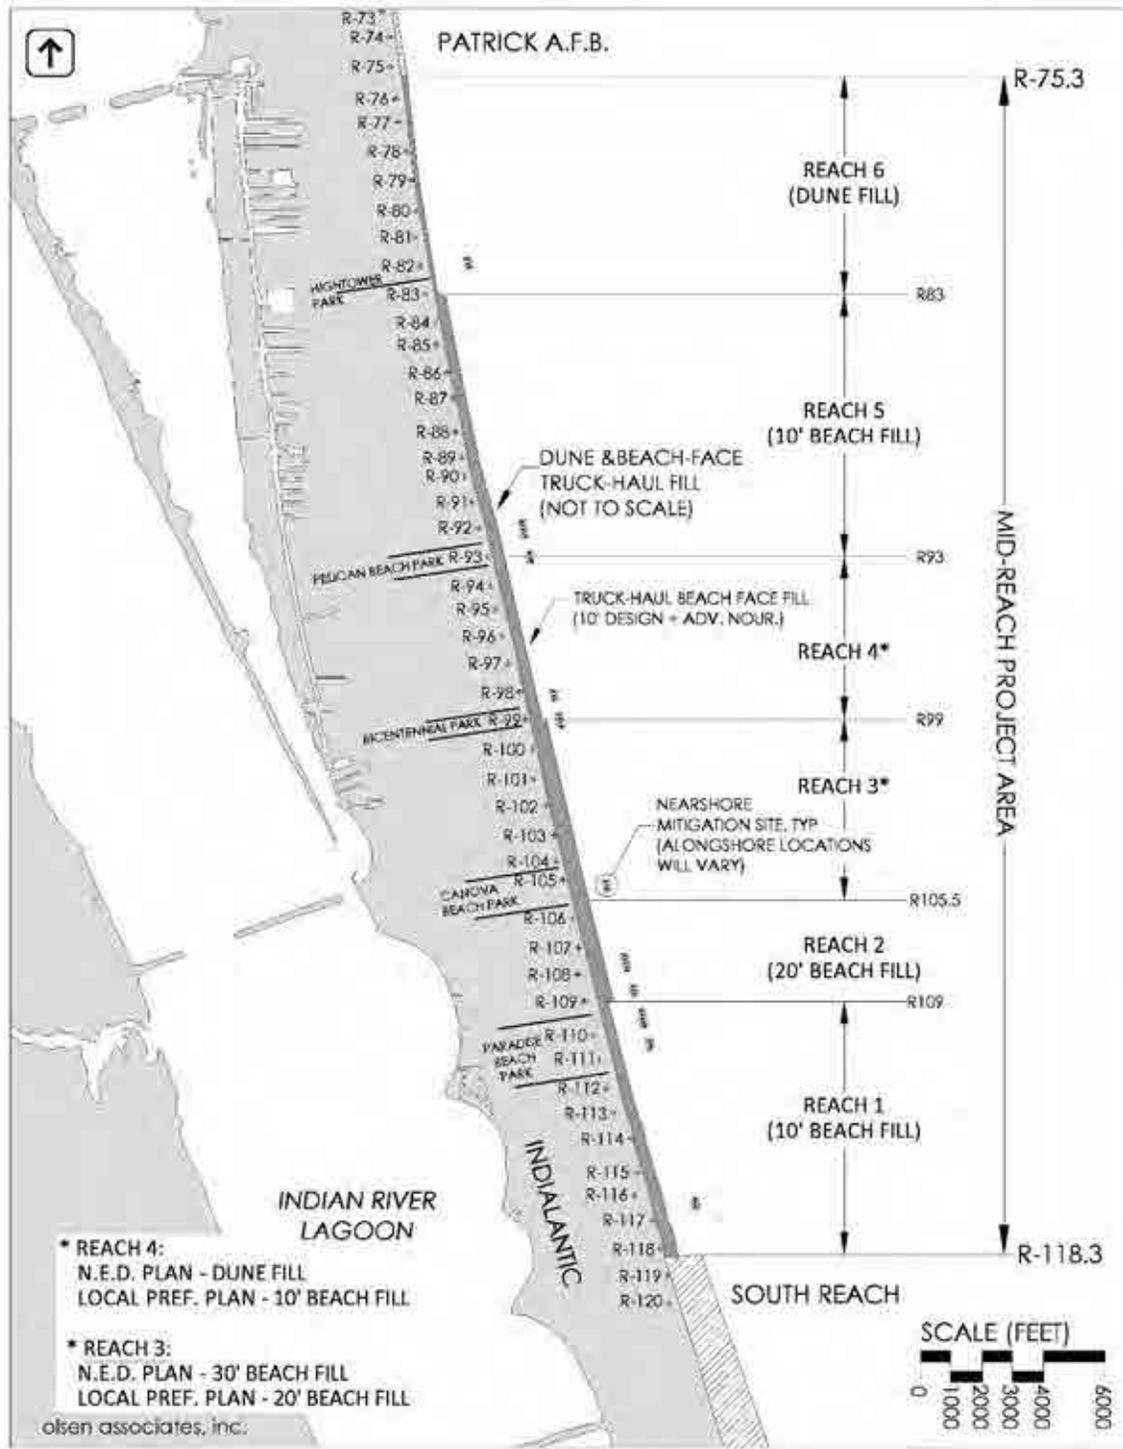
Proposed plan along the Mid Reach project shoreline for the Corps' NED Plan and Locally Preferred Plan. The beach fill plans (not drawn to scale) are identical for the two plans except along Reaches 3 and 4.
